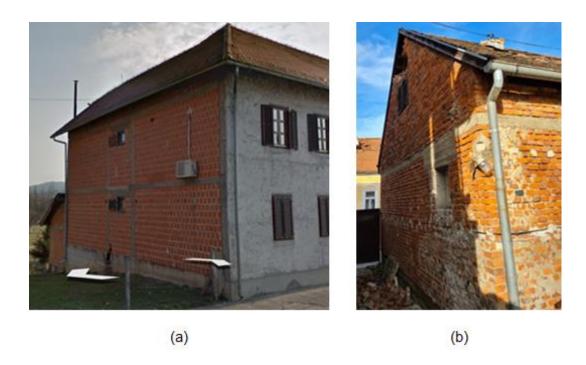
Modern masonry buildings in the earthquake-affected area: (a) two-story confined masonry building before the earthquake (source: Google Earth) and (b) single-story URM building with a rigid floor after the earthquake (source: Nenad Bijelić).
